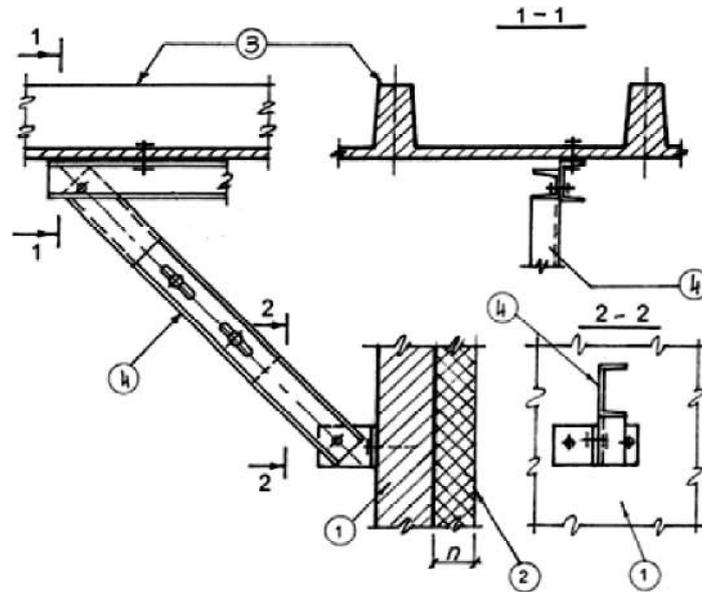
Scheme for fixing a prefabricated precast concrete panel (3) horizontally (see Fig. 2 for the position of the grid):
